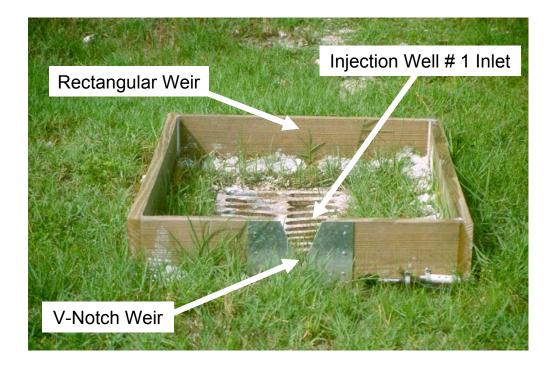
View of Outfall Weirs and Injection Well 1 Inlet.
